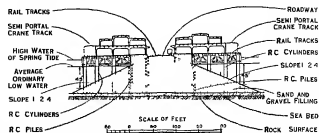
CROSS SECTION OF OUTER BERTHS BALLANTYNE PIER VAN COUVERUC
